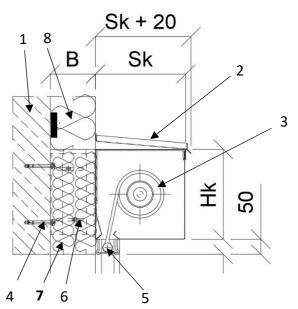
Wall-mounted installation of the guide rail with fire-proof insulation
